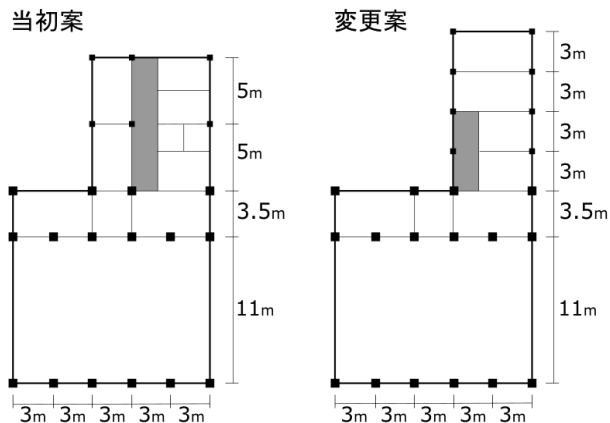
(left) The Niigata Branch of the Hokuriku Bank, New construction plan (Document number : 18058)
